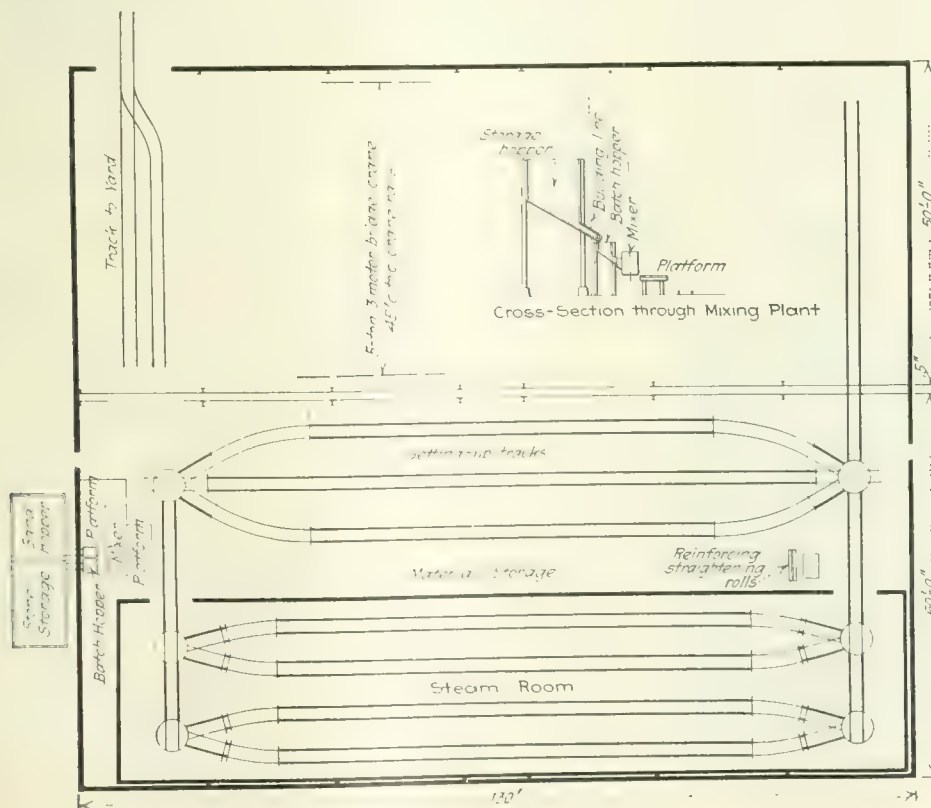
HOPPER MIXER AND TRACK LAY OUT IN BLOCK CASTING BUILDING
